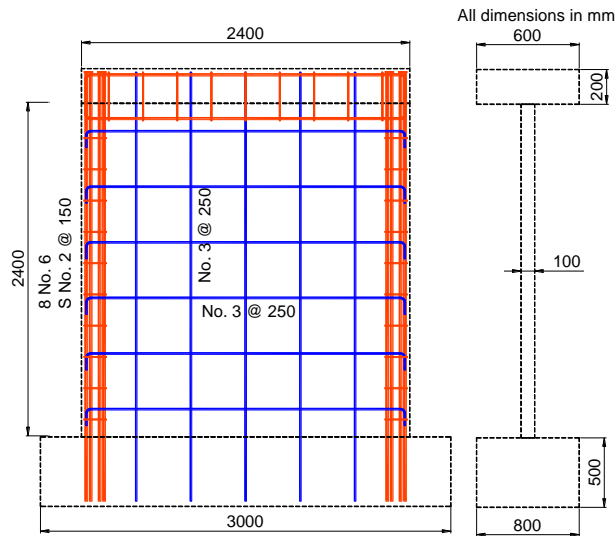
Geometry and reinforcement layout of a wall specimen: $h_w/l_w=1.0$, 100% of ρ_{min} and using deformed bars.
